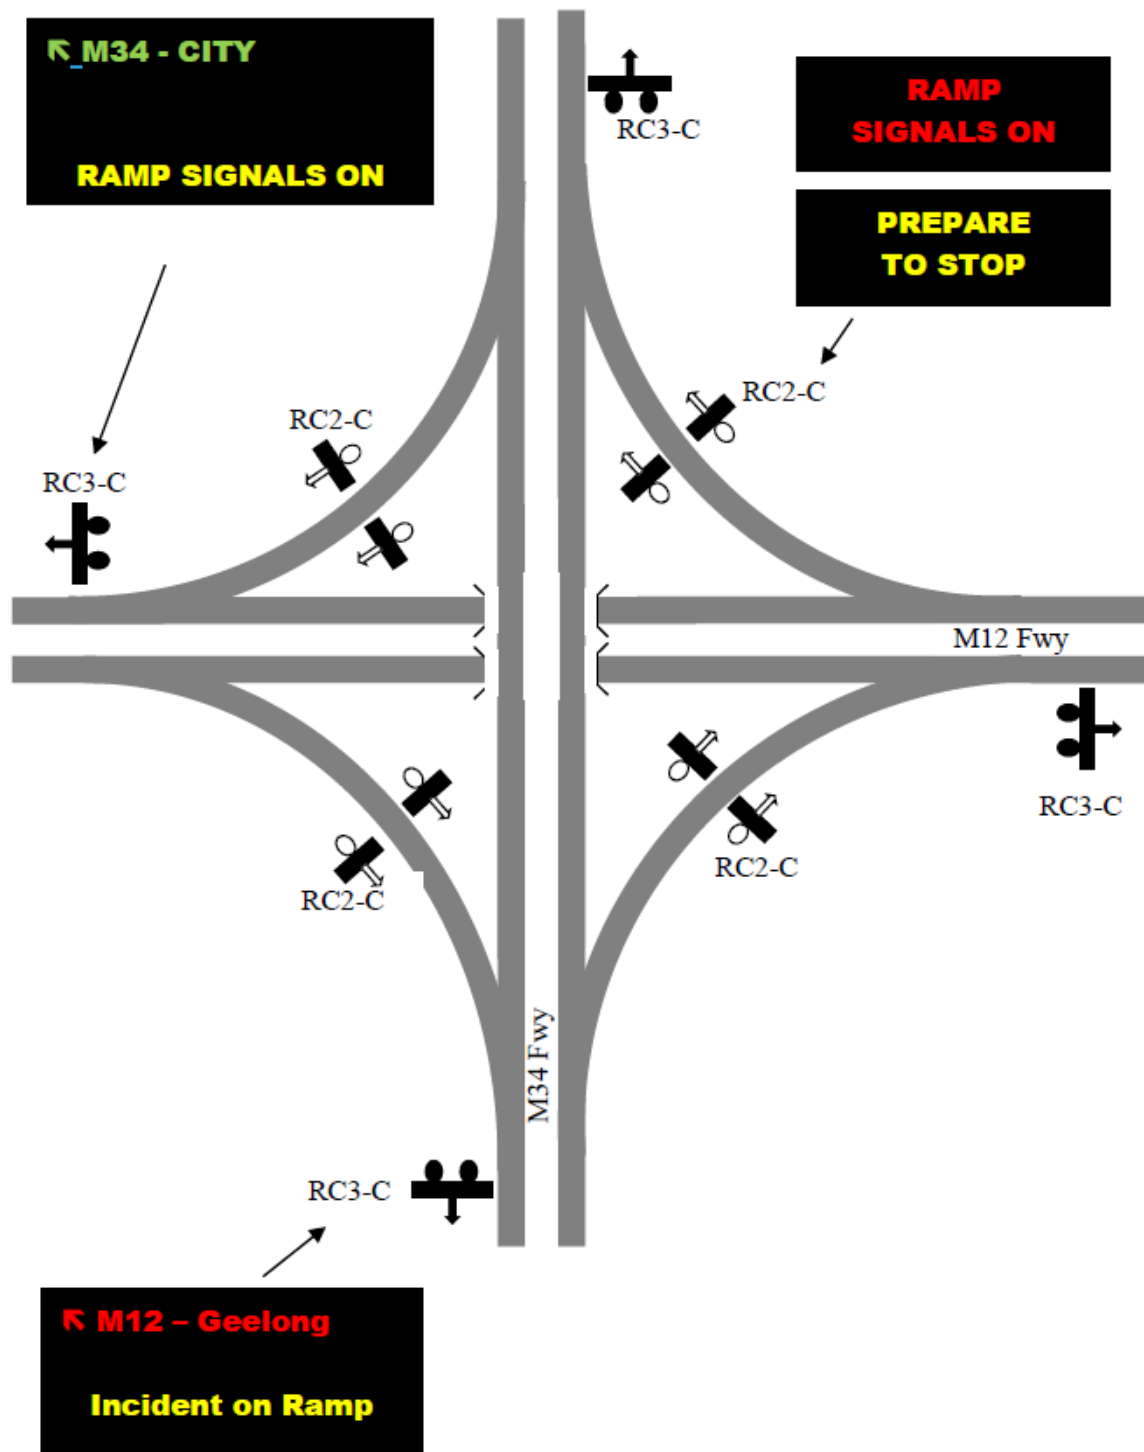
Typical Layout for RC2-C and RC3-C Signs, Freeway to Freeway
